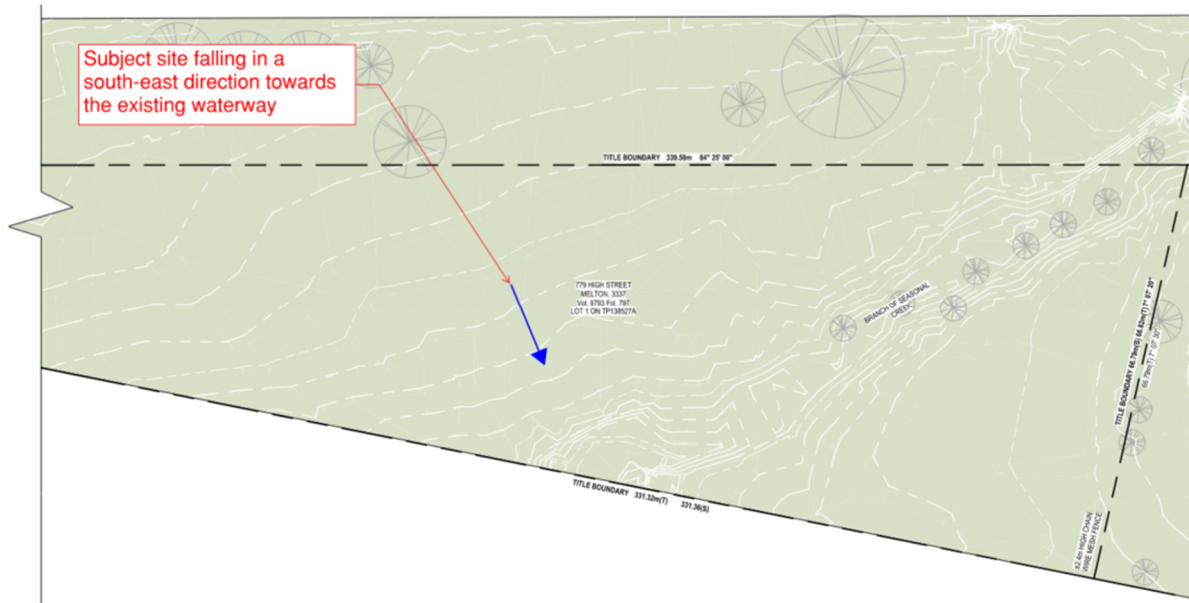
Subject Site Existing Conditions – West Portion (Image courtesy of DETAIL X Studio).
